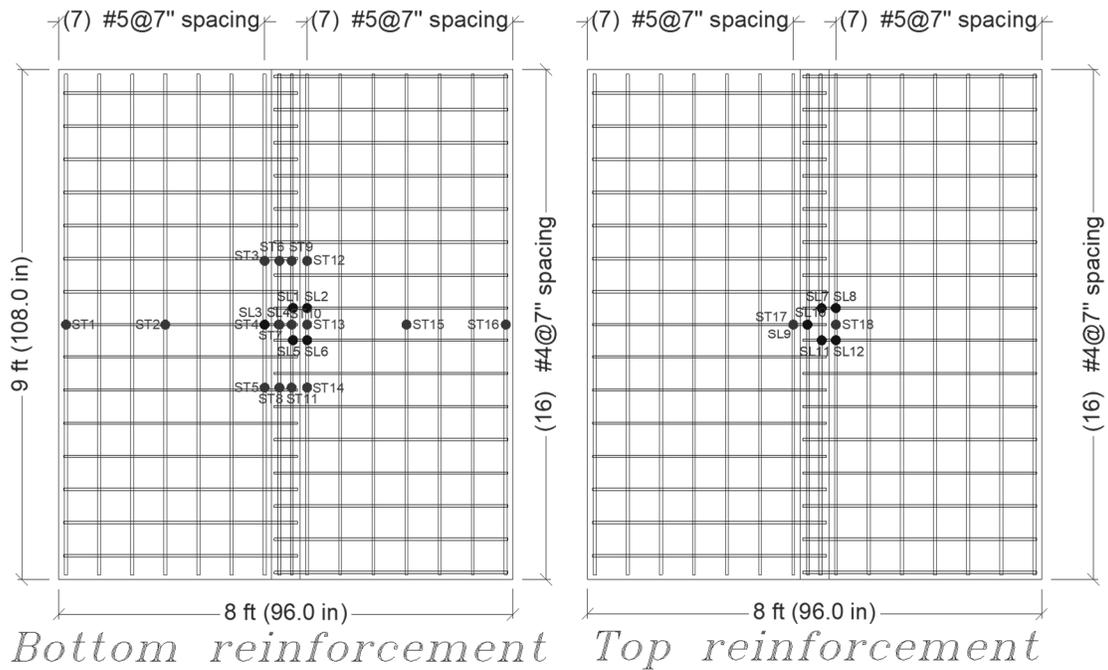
Structural details and instrumentation plan for the second transverse specimen (SP-2).
